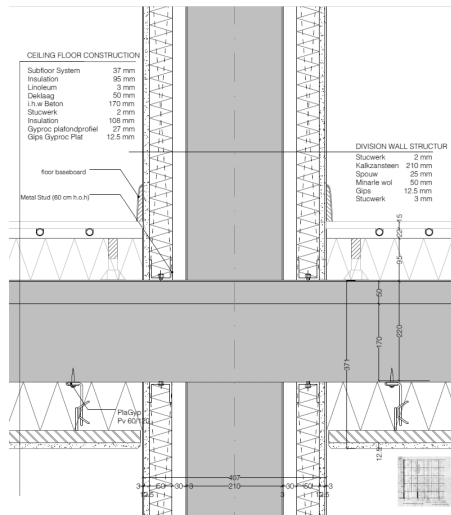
Detail between two apartments: sound insulation and floor heating (Source: by author).
